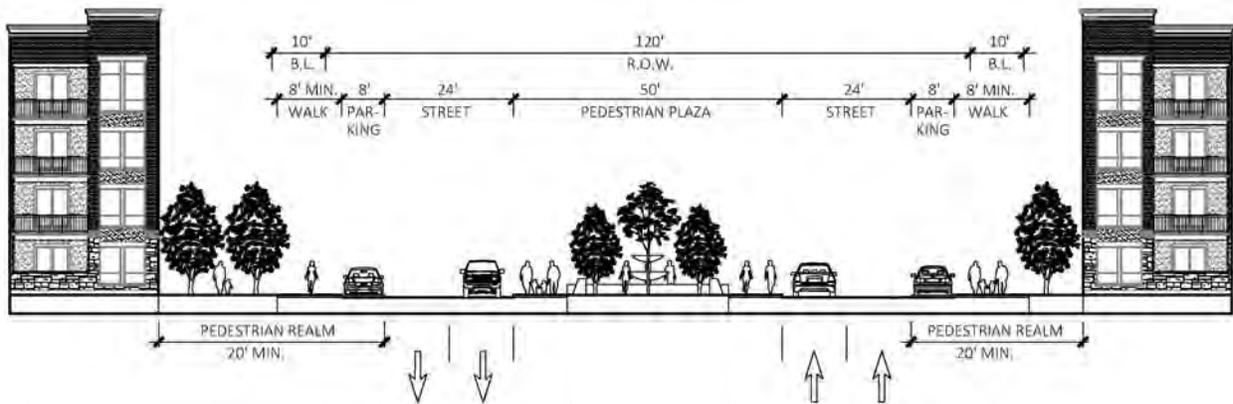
Type 'B' Street @ Pedestrian Plaza (with on street parking)
